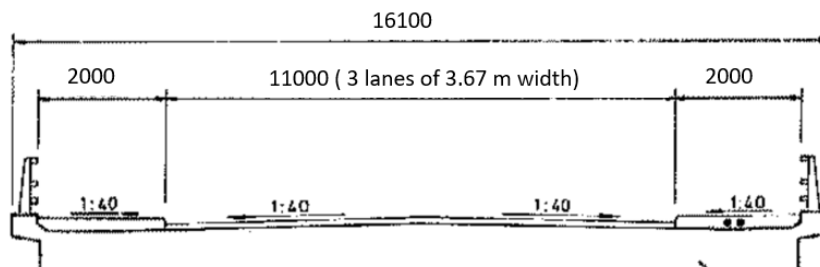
Proposed Lane Configuration of Pitmore Copse Bridge
